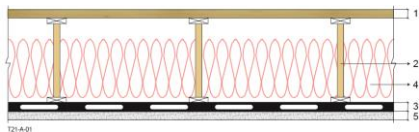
Structure for light-frame wood joisted floor/ceiling [1]
